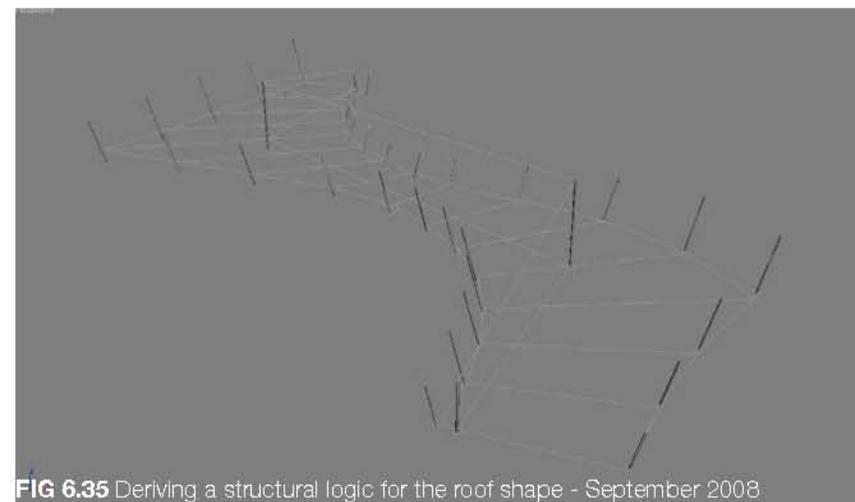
Deriving a structural logic for the roof shape - September 2008
